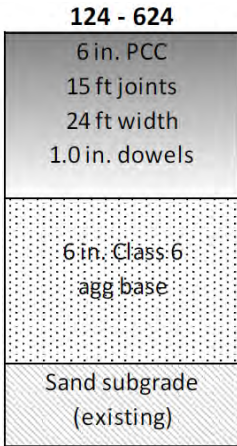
Concrete pavement section design for the early opening experiment (Cells 124-624) (from Van Deusen 2017)
